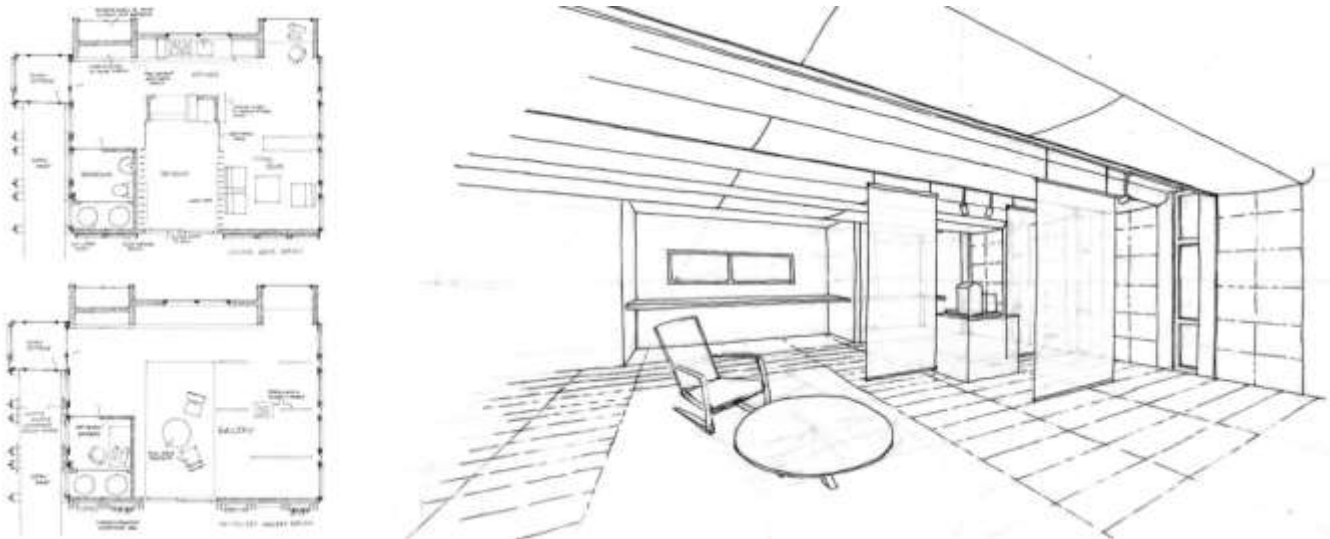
Left top: original plan; Left bottom: new plan; Right: new gallery in the large interior space of the house
